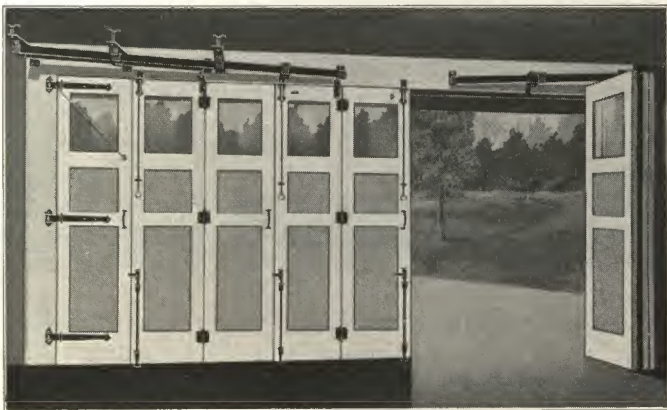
Illustration shows In-Opening Set 1035-A8-31. Doors are hinged to the jambs with 1035 offset hinges. All sets on this page, either In-Opening or Out-Opening, use 1035 offset hinges at the jamb
